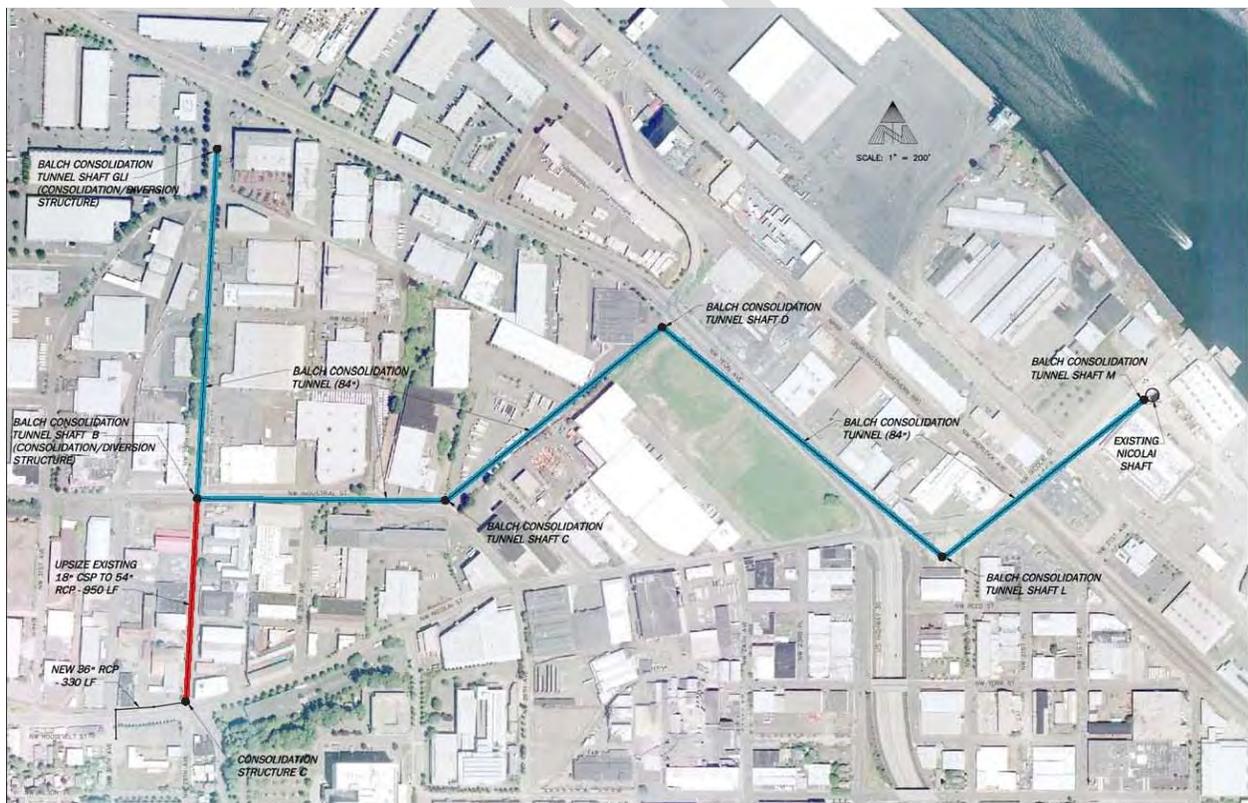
Balch Consolidation Conduit – Alignment Plan View
